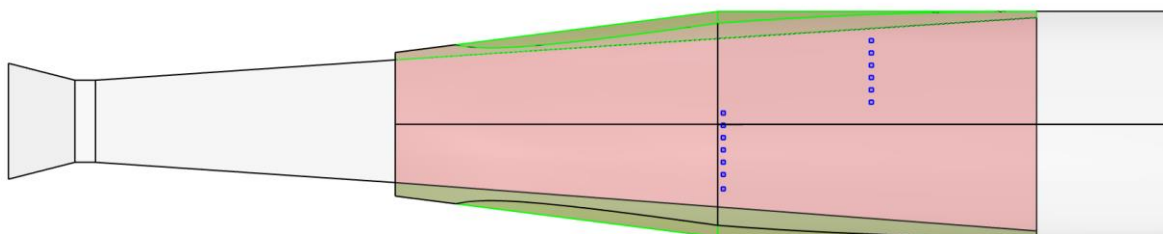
Side walls as diffuser extension in addition to bottom ramp plus squared calming piles with 20/20 cm, plan view
